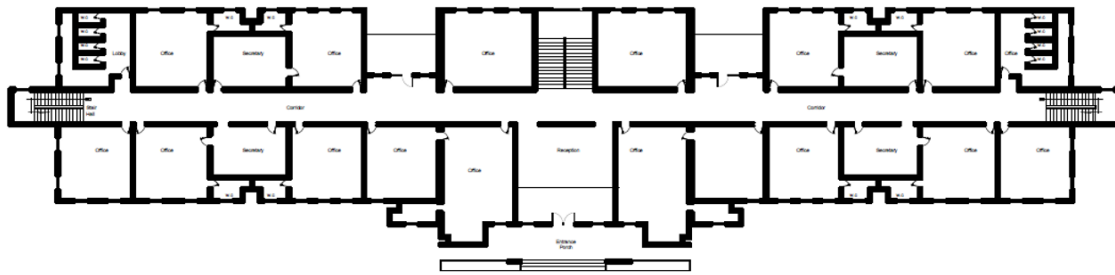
Typical Ground Floor Plan of the Phase I Secretariat
